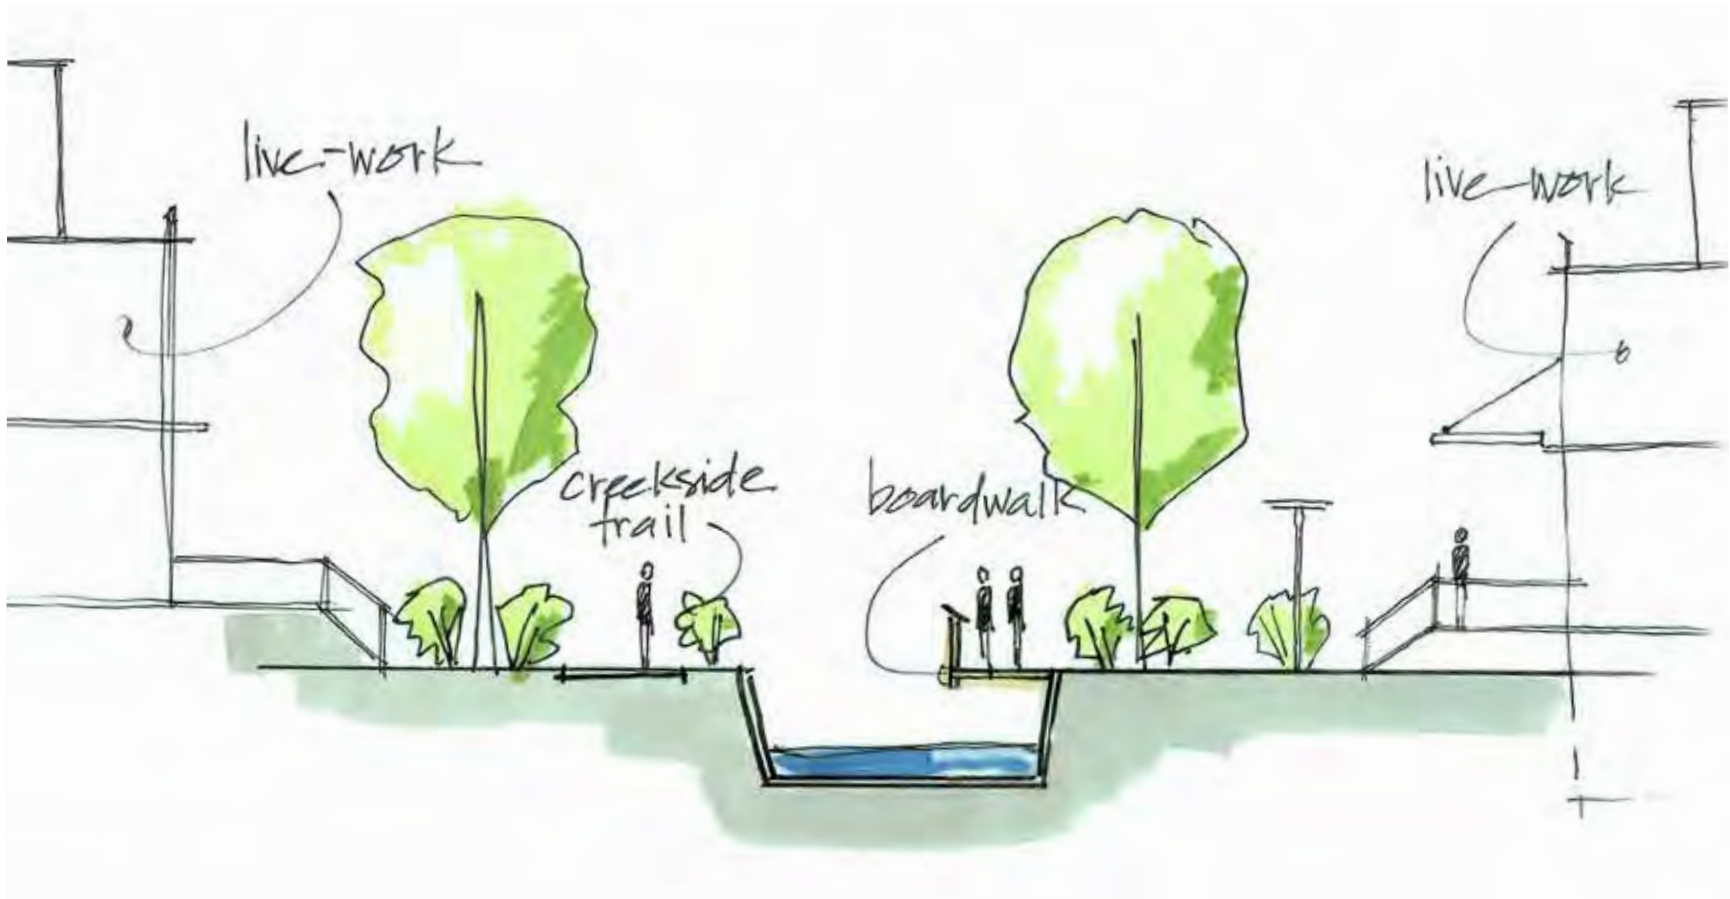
Creek section, adjacent to Market Precinct Live-Work Buildings
